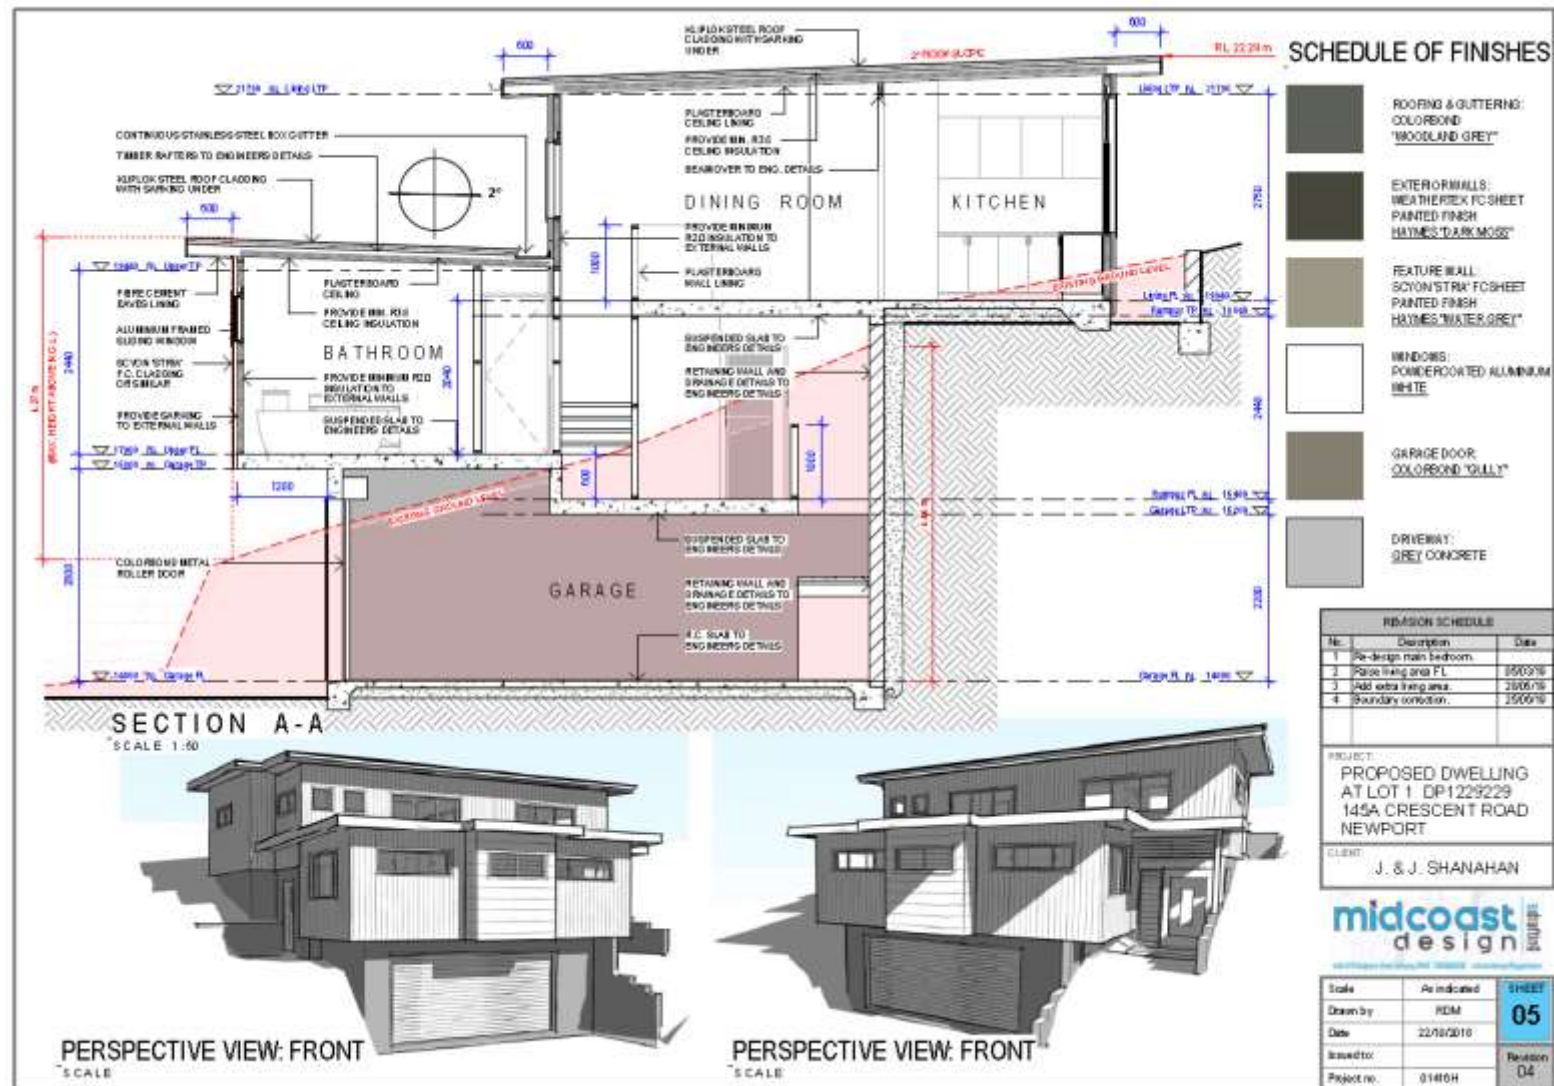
Illustrates the proposed new dwelling Site Analysis, Stormwater, Elevations, Section & Perspective images.
